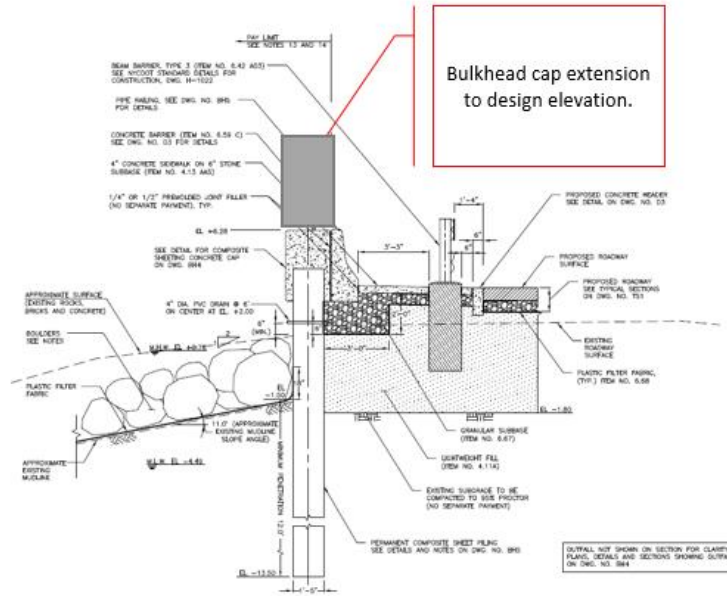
Broad Channel Street End Bulkhead Typical Plan and Section (taken from DDC Project ID-HWQ1182A for illustrative purposes only)
